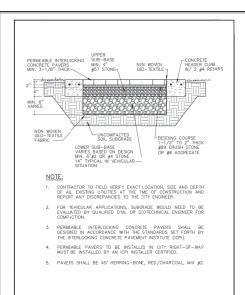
DETAILS DELRAY RIDGE 3, GRADING, & DRAINAGE D PAVING,
